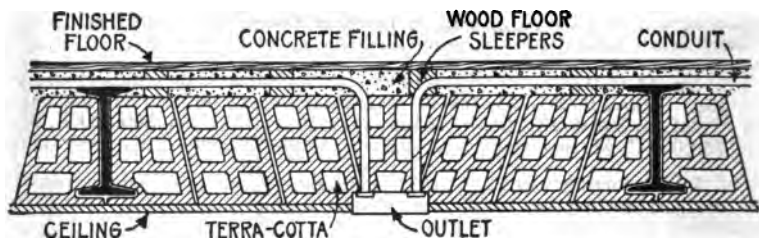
,197.—Method of installing conduits in fire proof buildings. *The installation of the conduit includes the placing of all outlet boxes, and when this has been completed, the lathing or plastering work is executed, and after that is finished, the wire is pulled into the tubes, and the receptacles, switches, etc., put in position. The work of pulling in the wires may be greatly facilitated by the use of pull boxes as shown in figs. 7,171 and 7,173.
